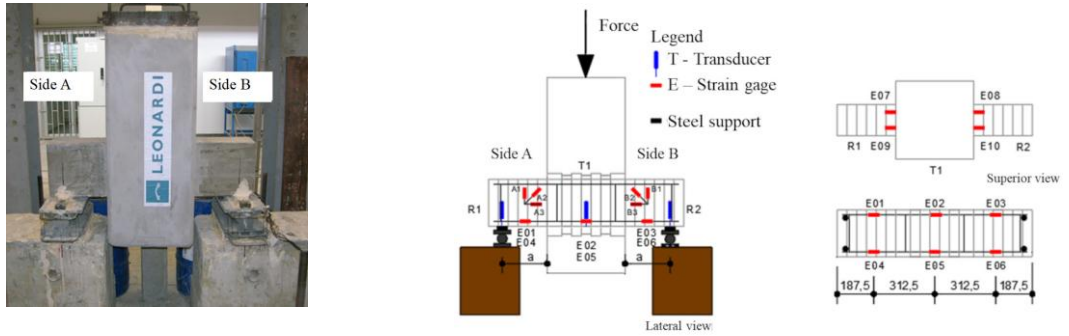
a) Specimen under test b) Test setup and instrumentation
